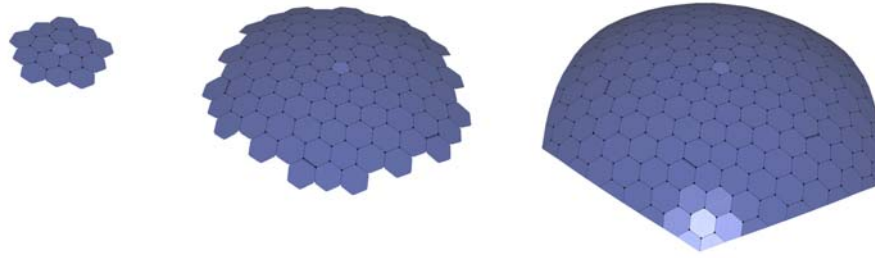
A possible phased in-situ construction method; the structure is built top down.
